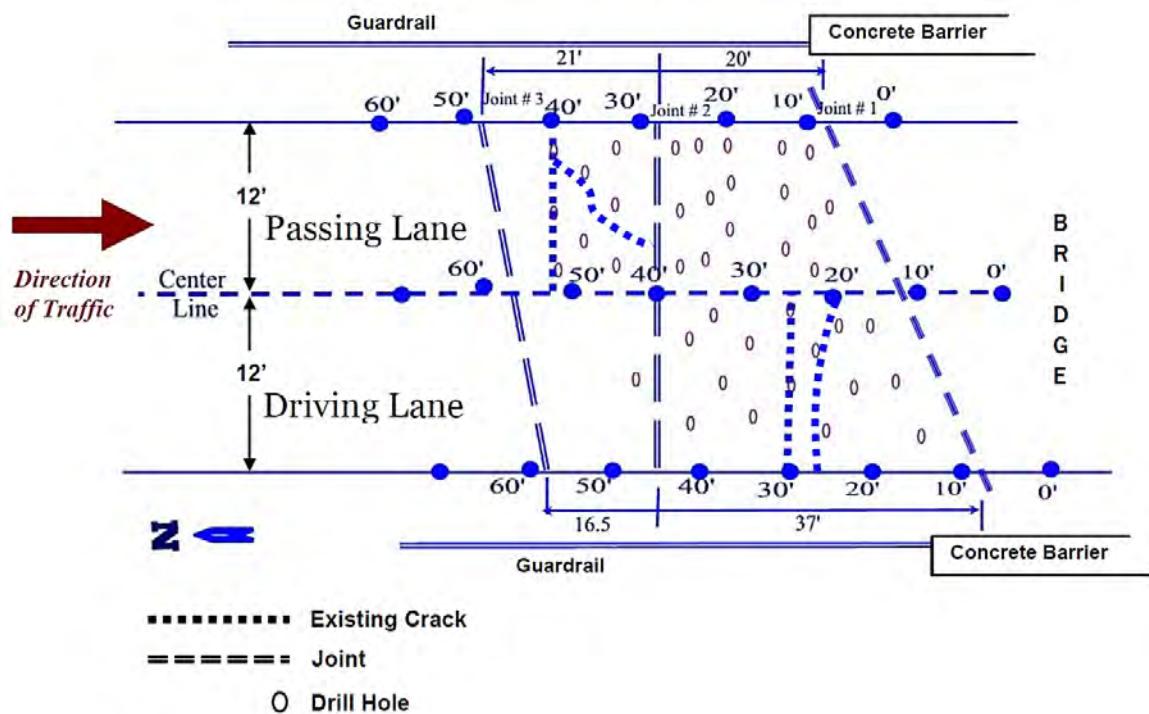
WisDOT slab jacking, I-39 grout holes layout.
